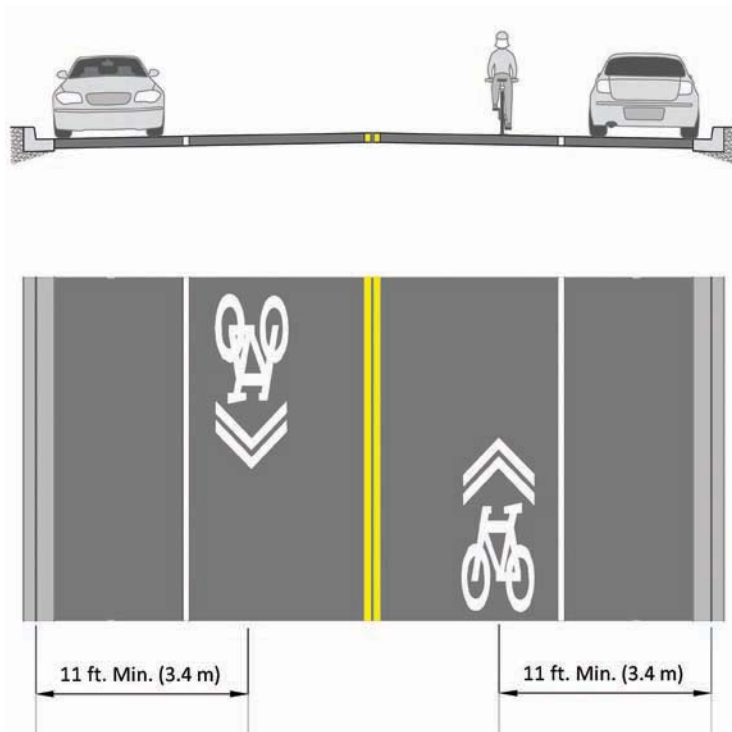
Typical Shared-Lane Marking Cross Section on Street with Parking
